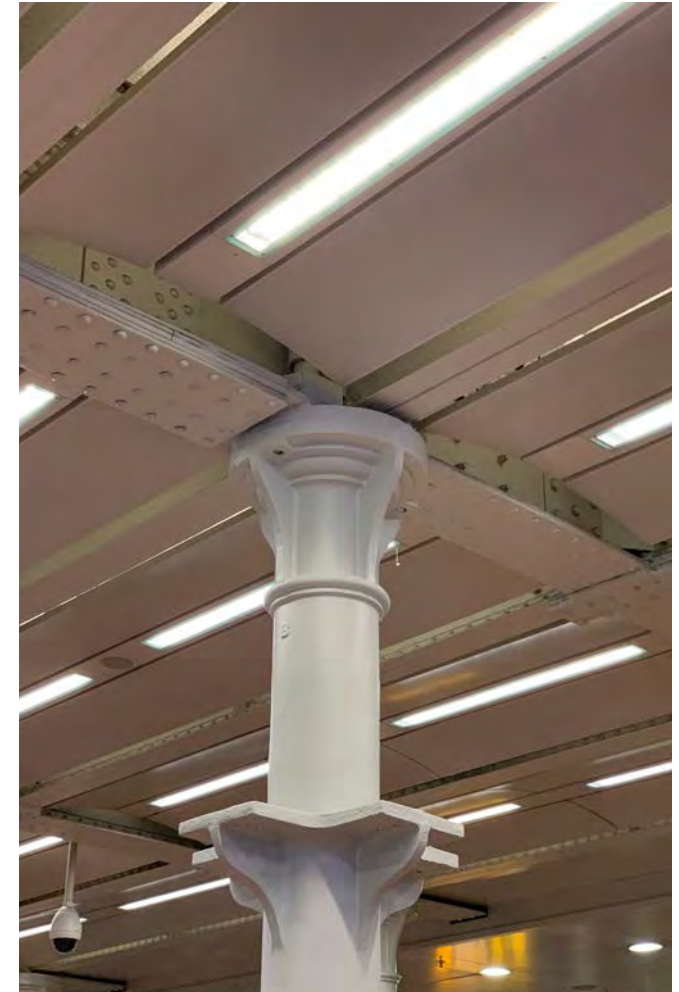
London St Pancras - 'Eye-Brow' ceiling of modern renovation
